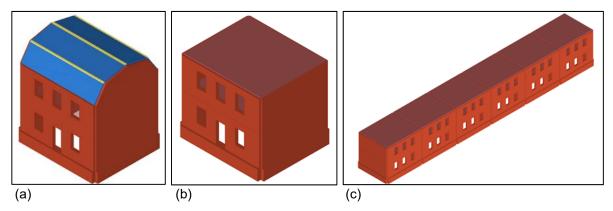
Prototype buildings: (a) Flat Mansard roof, (b) Flat regular roof, and (c) Row of 6 houses
